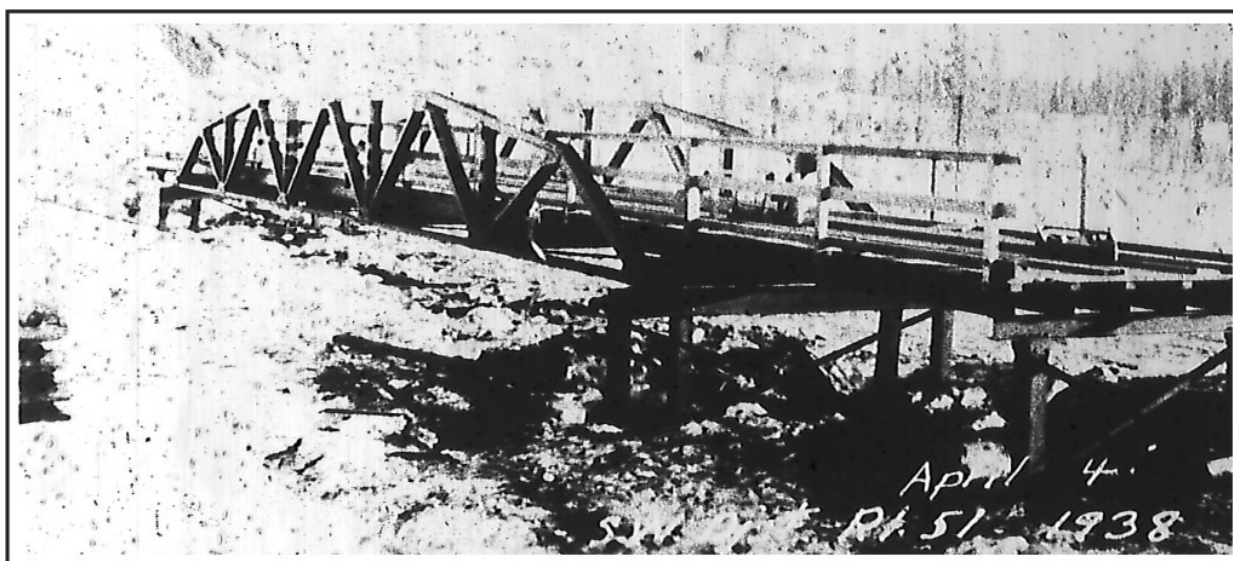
The steel pony bridge at Ganes Creek, 1937. The old timber Howe truss is in the background. U.S. Alaska Road Commission Collection, PCA-16-1-07, Alaska State Library.
